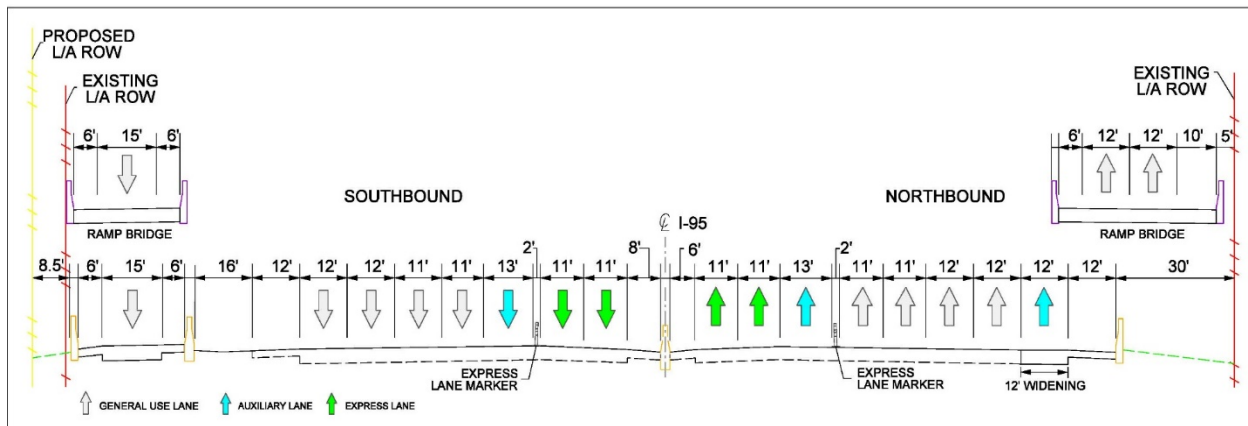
Alternative 2 Roadway Section North of Hallandale Beach Boulevard.
